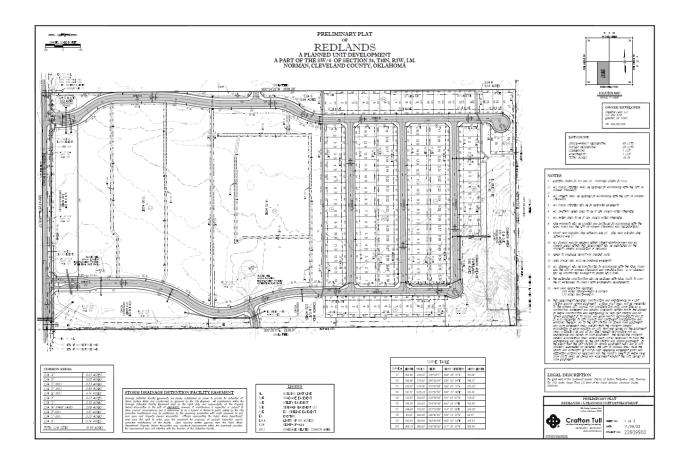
EXHIBIT E Preliminary Open Space Plan Full Size Documents Submitted to City Staff
